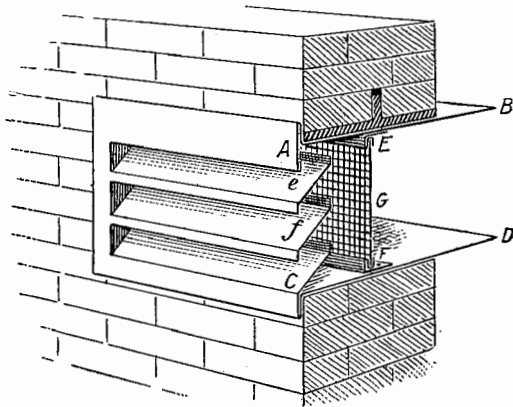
Construction of Wall Duct with Metal Louvres and Mesh Frame
